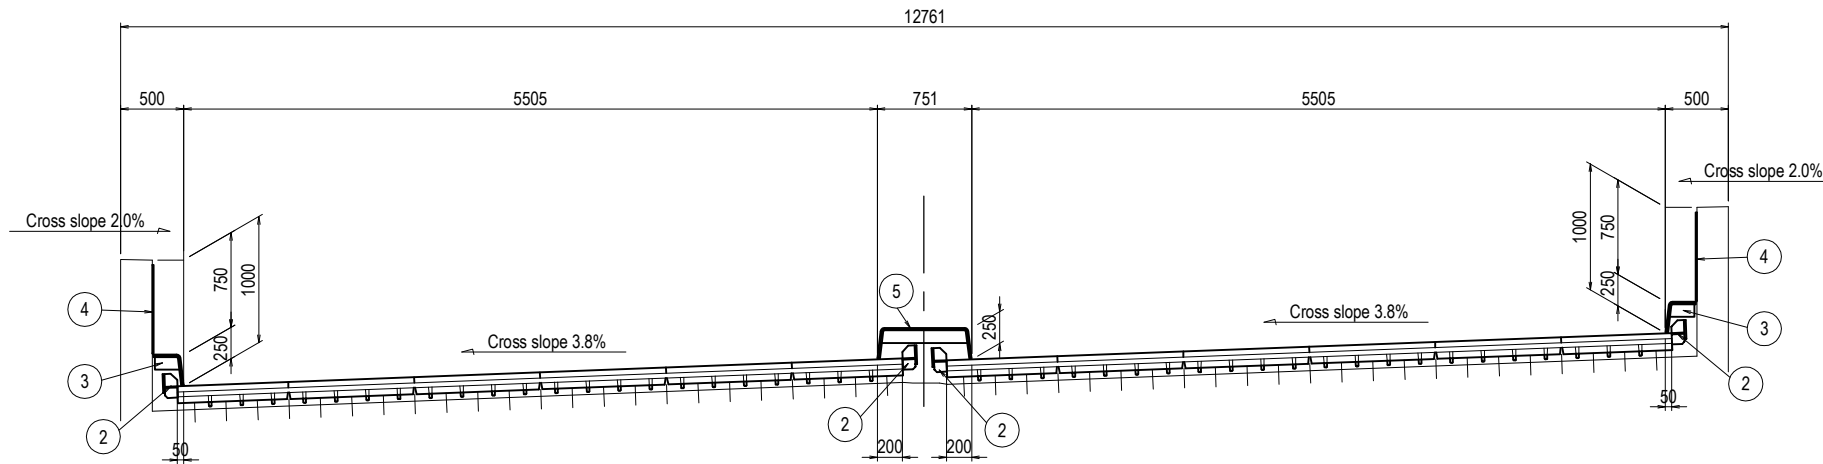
# DETAIL OF EXPANSION JOINT (PF7-PF11) (1)
